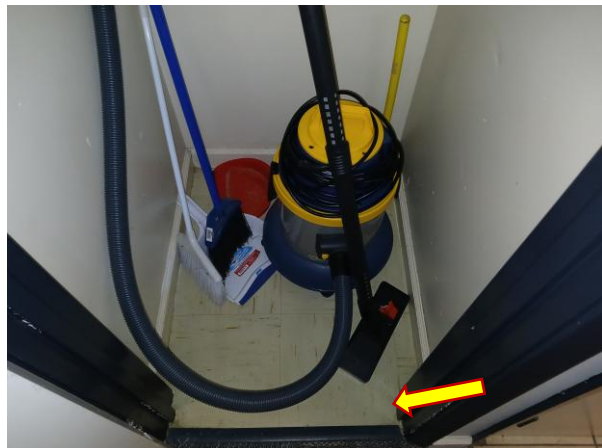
View of the asbestos-containing caulking between the base of the door frame and foundation base on the east exterior wall of Unit G5 at the Subject Location.
